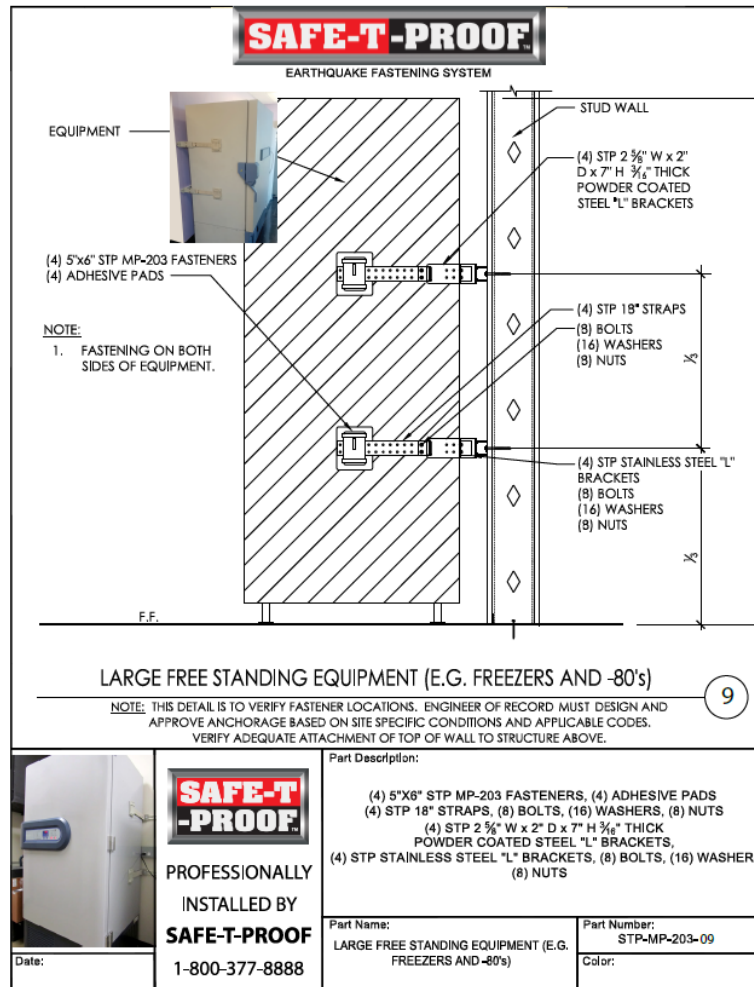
EXAMPLE STP-MP-203-09 INSTALLATION DETAIL
